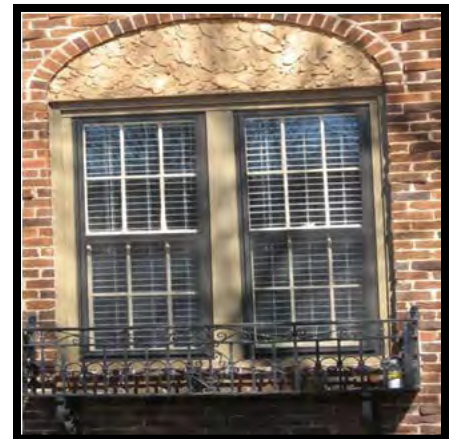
STORM WINDOWS SHOULD BE FULL-VIEW DESIGN OR HAVE STRUCTURAL FRAMEWORK ALIGN WITH WINDOW MEETING RAIL (PICTURED).
